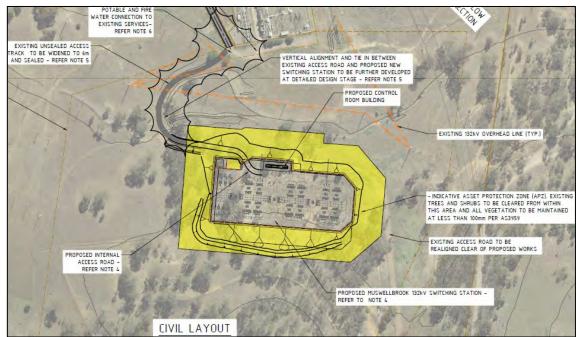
Extract of Sandy Creek STSS general arrangement (AECOM, Drawing No. 265663, Amd. E, 02/02/2024)
